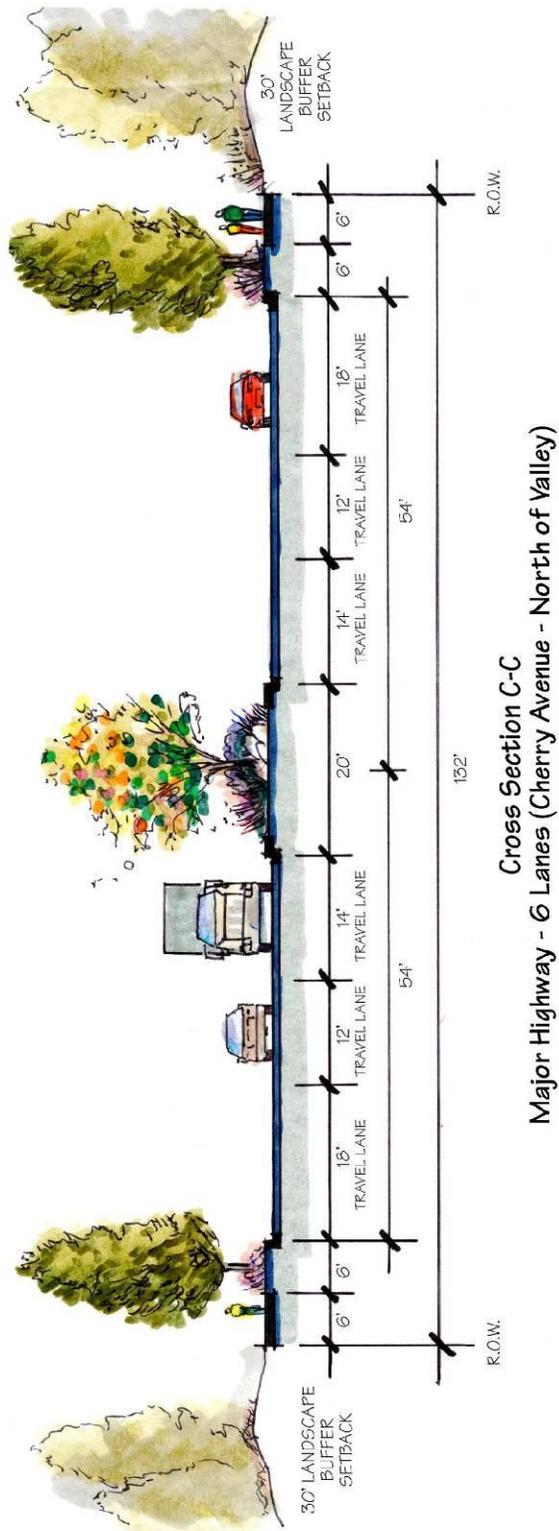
Major Highway – 6 Lanes – Cross-Section C-C (Cherry Avenue – North of Valley)
